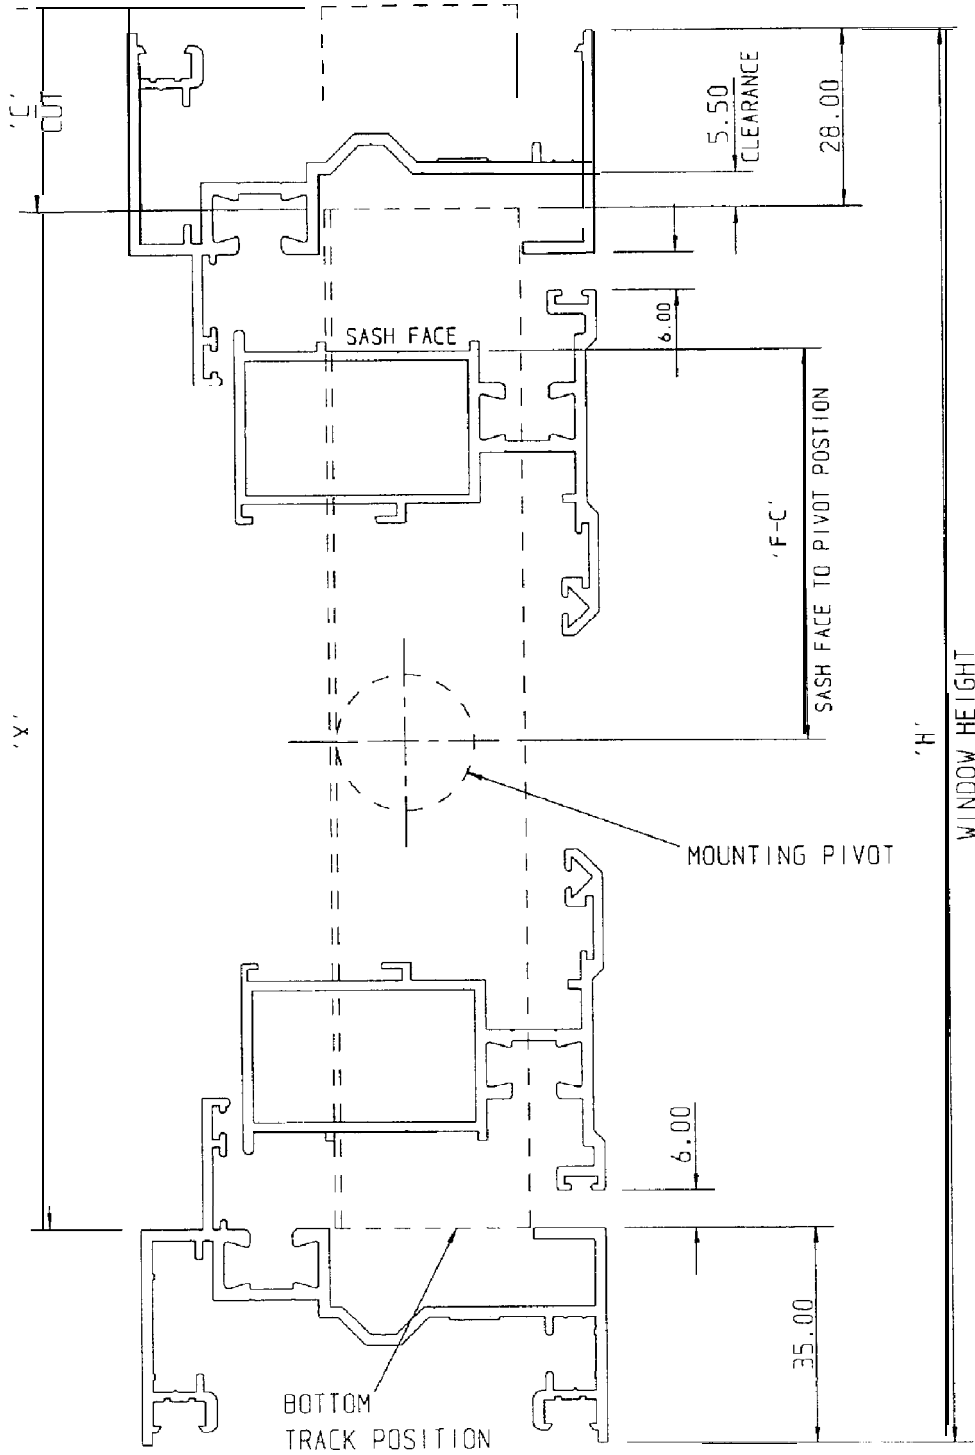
LAYOUT FOR PN - UNI TOP SWING HINGE
